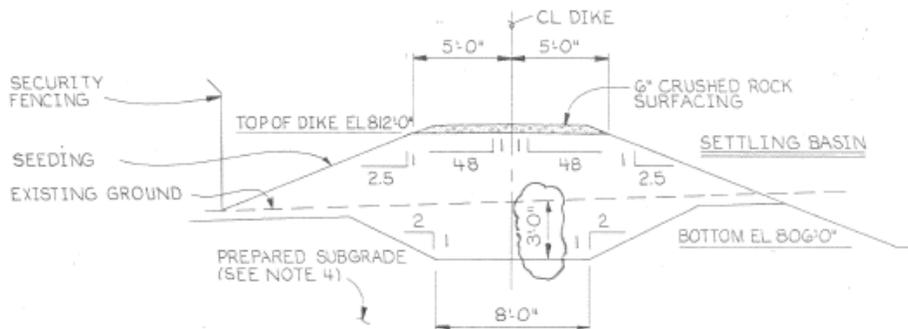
Typical Embankment Cross-Section of South Embankment, (Black & Veatch, 1977)
